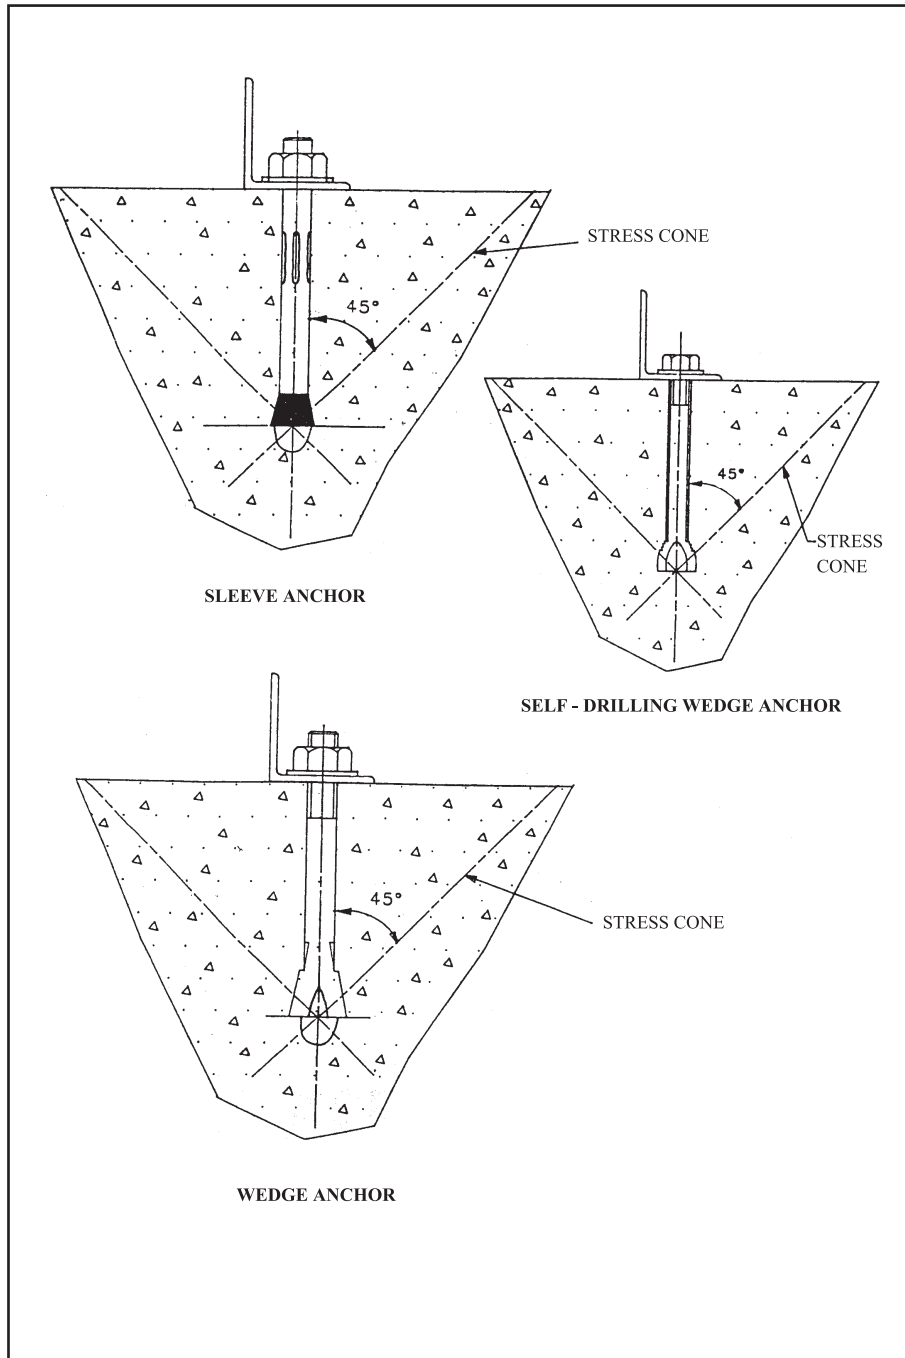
TYPICAL DETAILS OF EXPANSION ANCHOR
